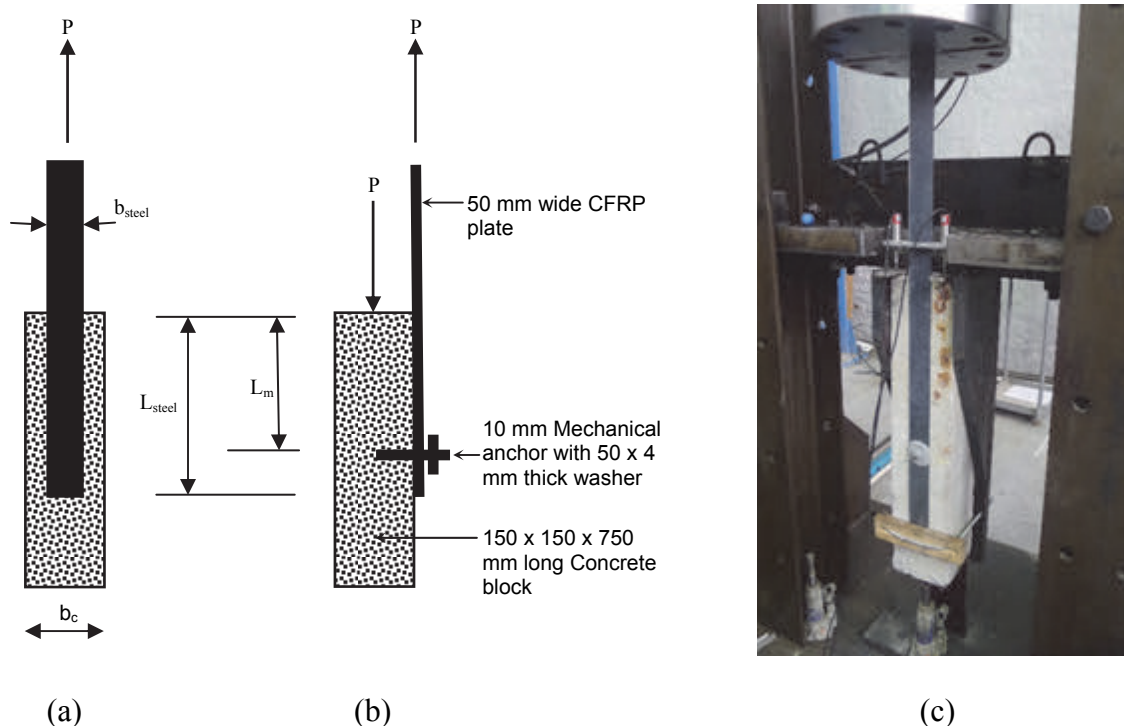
Single shear pull off test with the near end supported (a) Schematic front view (b) Schematic side view (c) Image of complete set-up
